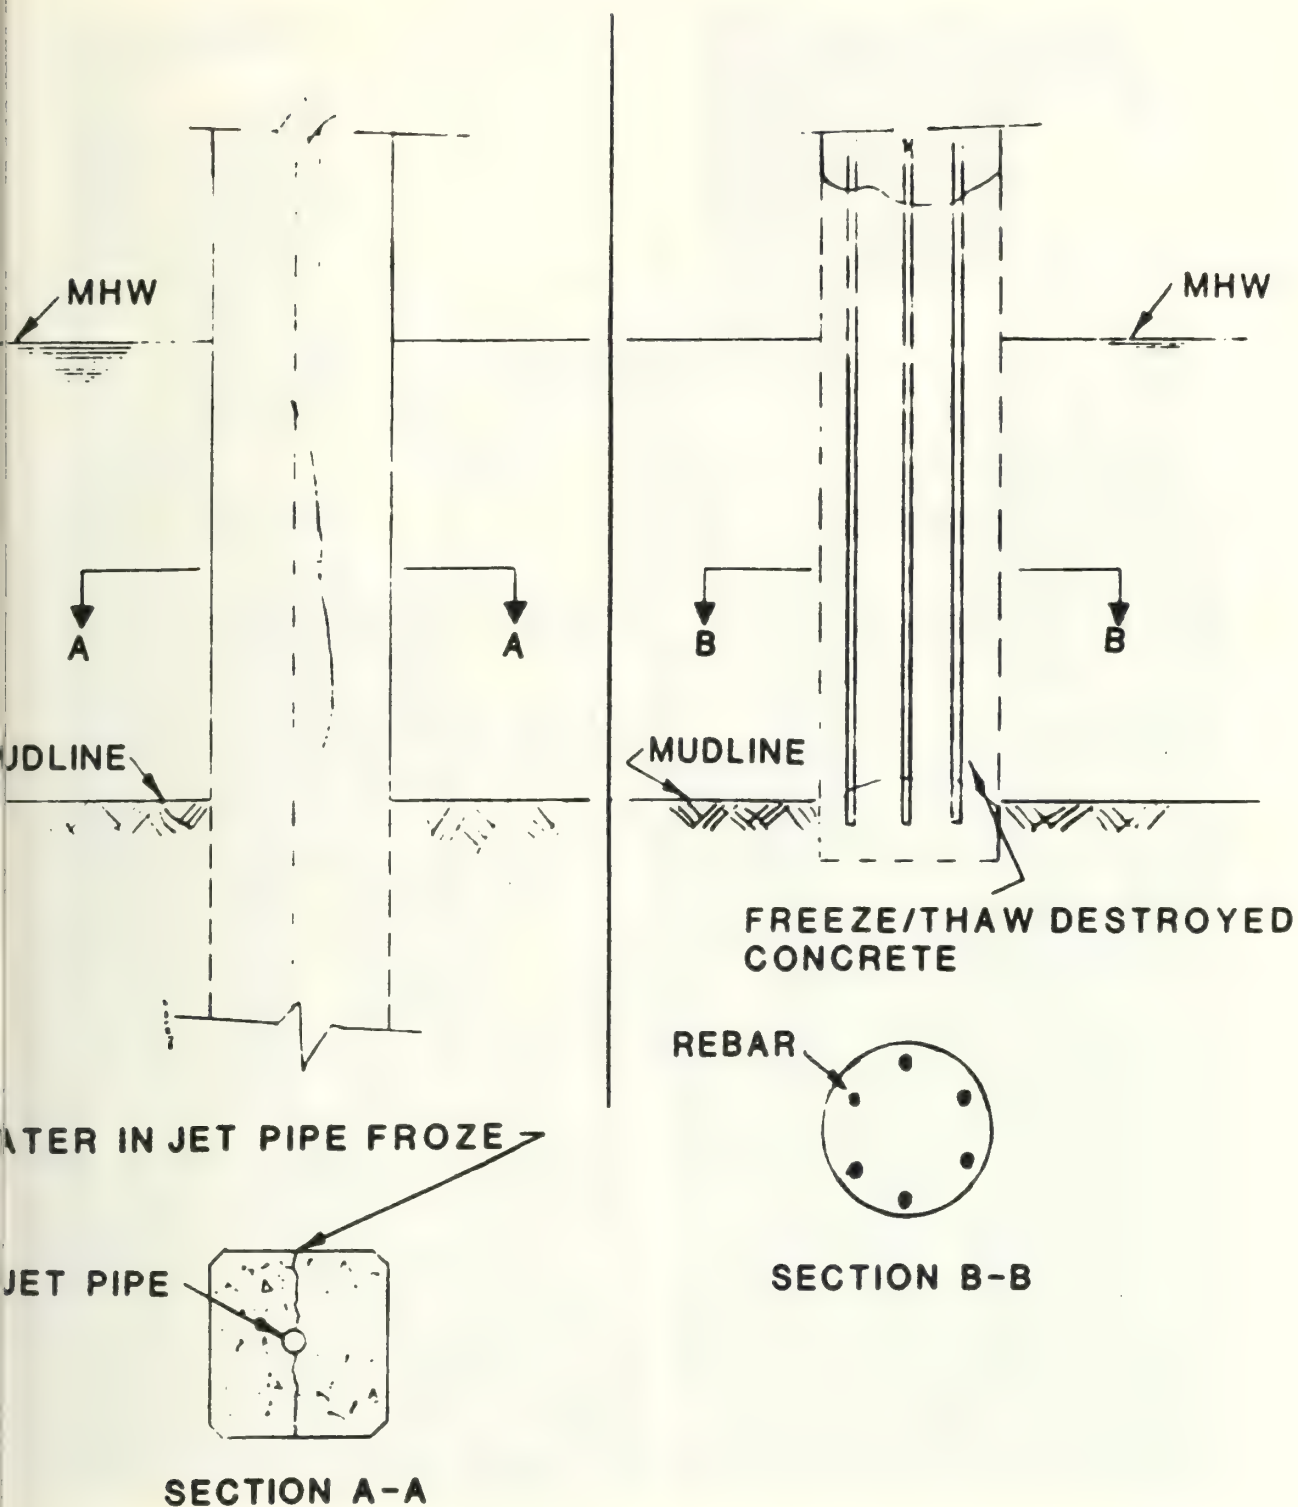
Deterioration of reinforced concrete piles due to freeze/thaw cycle
